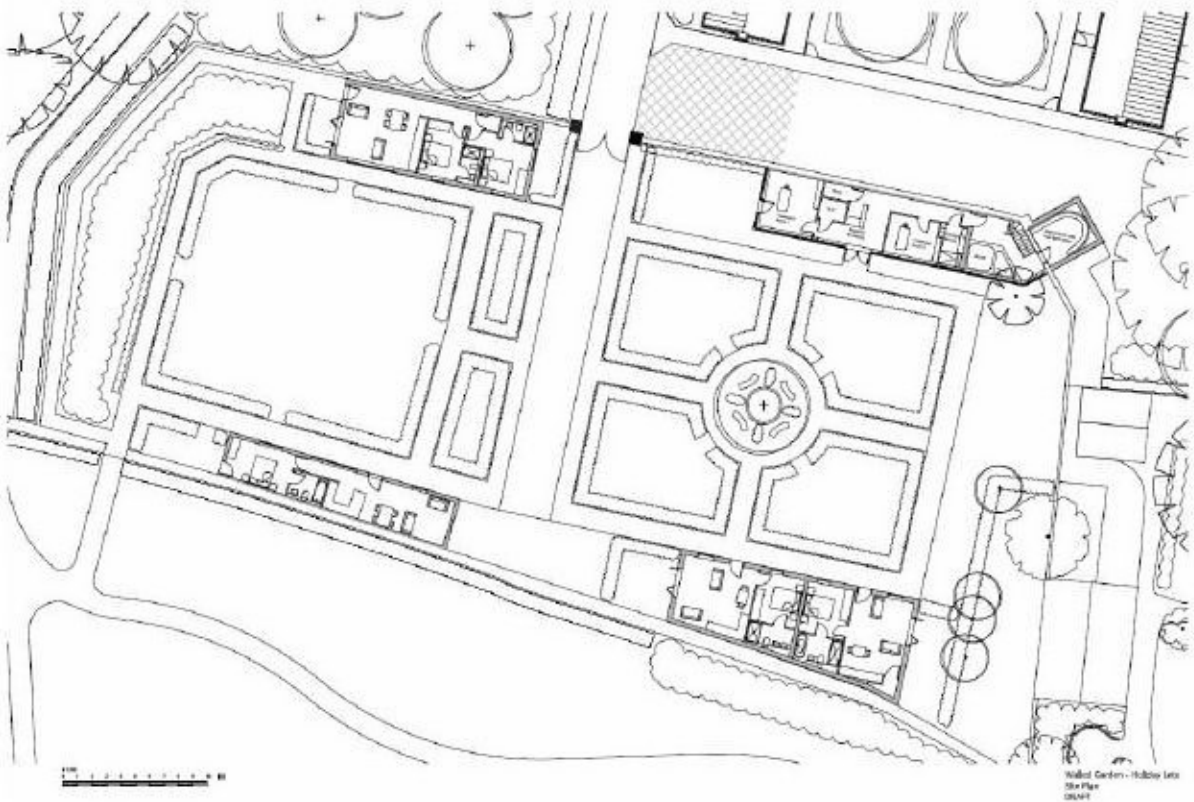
Concept plan for the site: four roughly equally disposed lean-tos; central gardens
